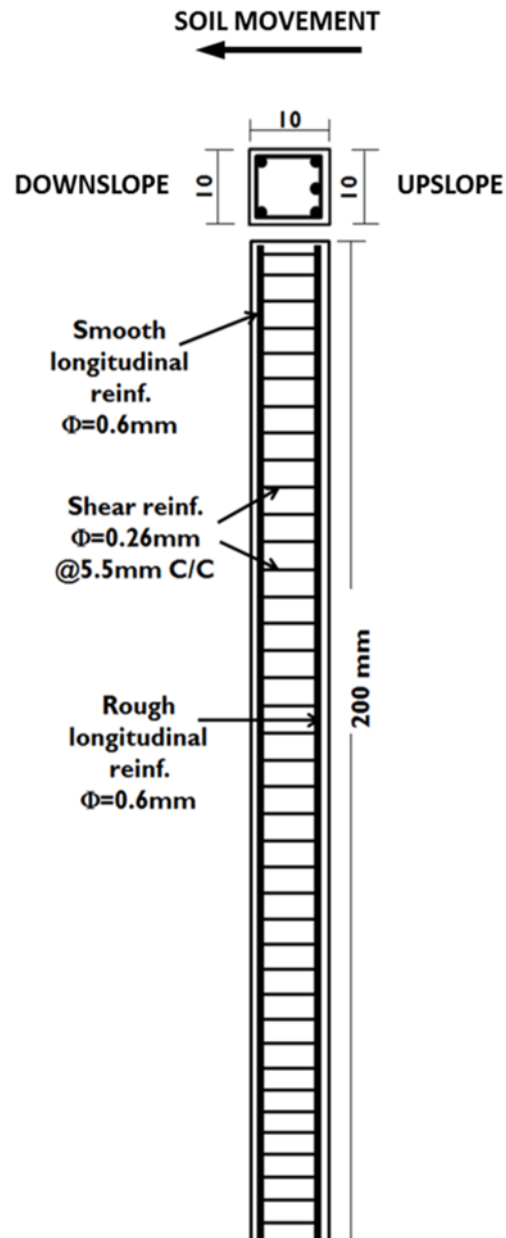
22): Model RC pile section (all dimensions shown at model scale).
